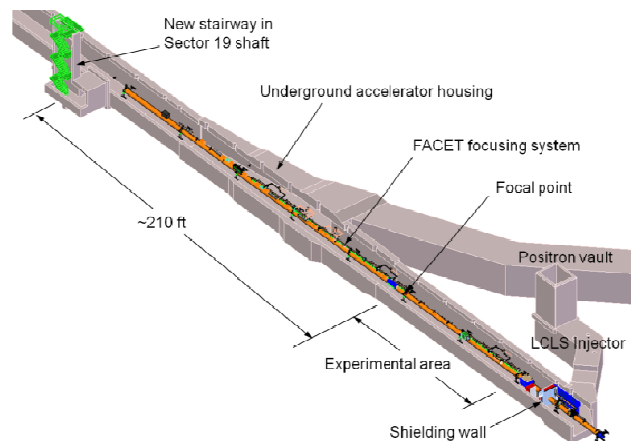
Cutaway view of the linac tunnel in Sector 20 showing the locations of the new stairway, the FACET systems, and the shielding wall.
